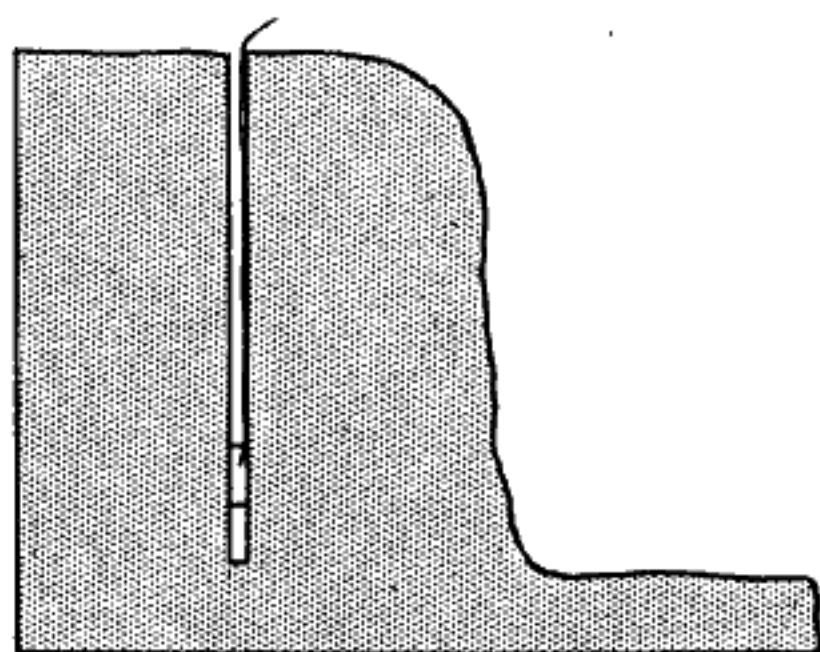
Location of a deep, vertical bore hole in a road cut. When R. R. P. or blasting powder is used, the hole is usually sprung.
